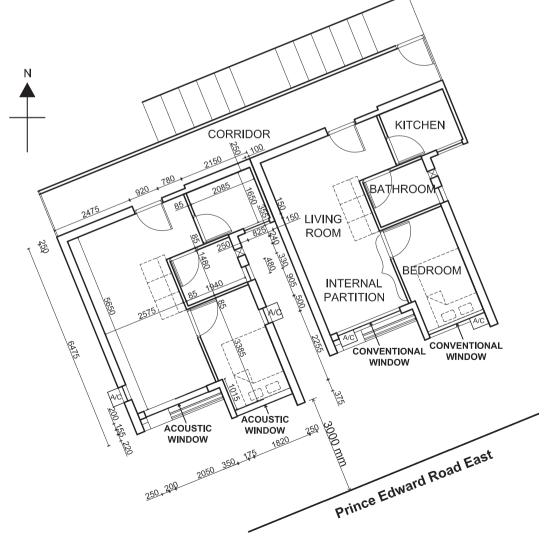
Layout plan of the mock-up flats (All dimensions in mm).
